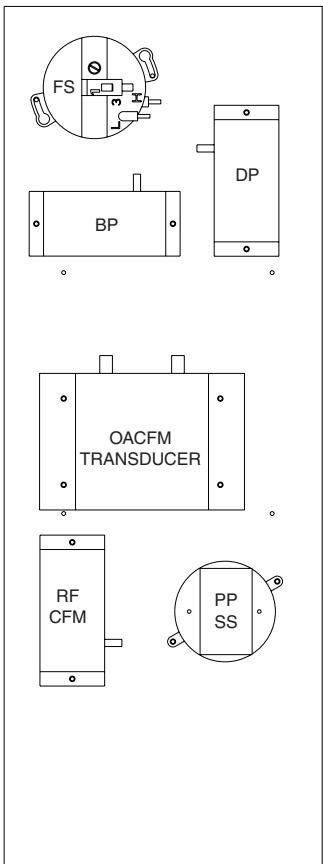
Auxiliary Control Box Details (Sizes 030-050)
